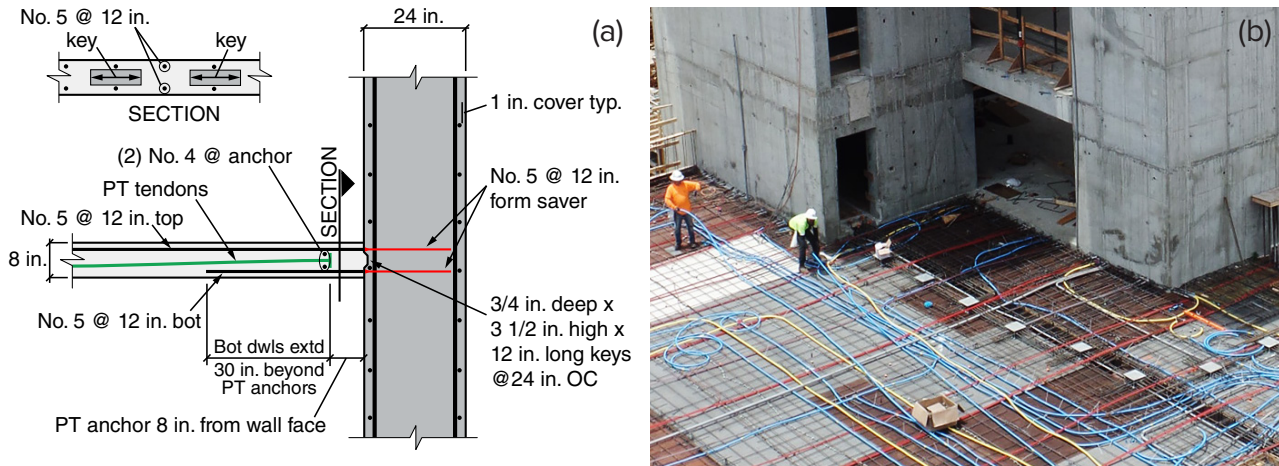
A highly constructable option for strand anchorage is to place dead-end anchors near the wall face: (a) a detail from the referenced article; and (b) use of such details allows walls to be constructed ahead of floor structures. (Image courtesy of Ceco Concrete Construction.)
